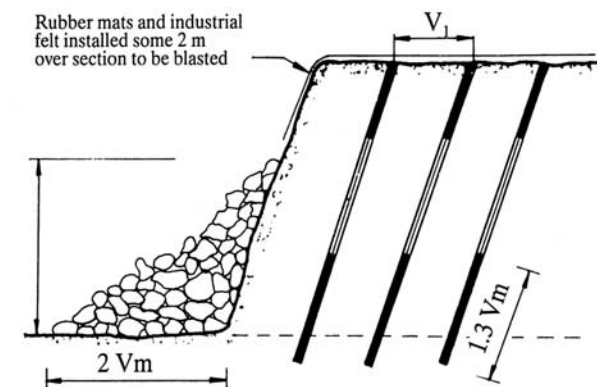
38. Using blasting mats and backfill to prevent flyrock.
